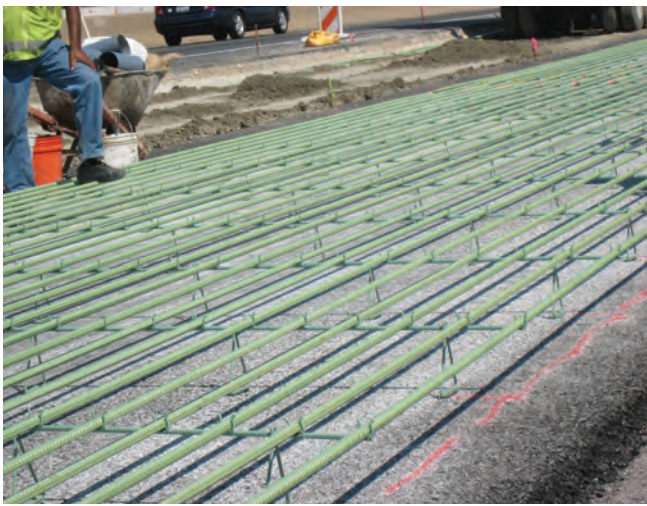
Reinforcing for CRCP (photo courtesy of Mike Ayers, American Concrete Pavement Association)
